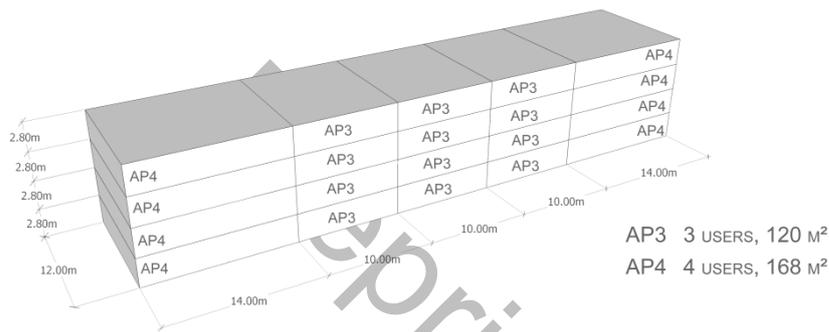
Basic geometric and volumetric layout of modelled low rise apartment buildings
